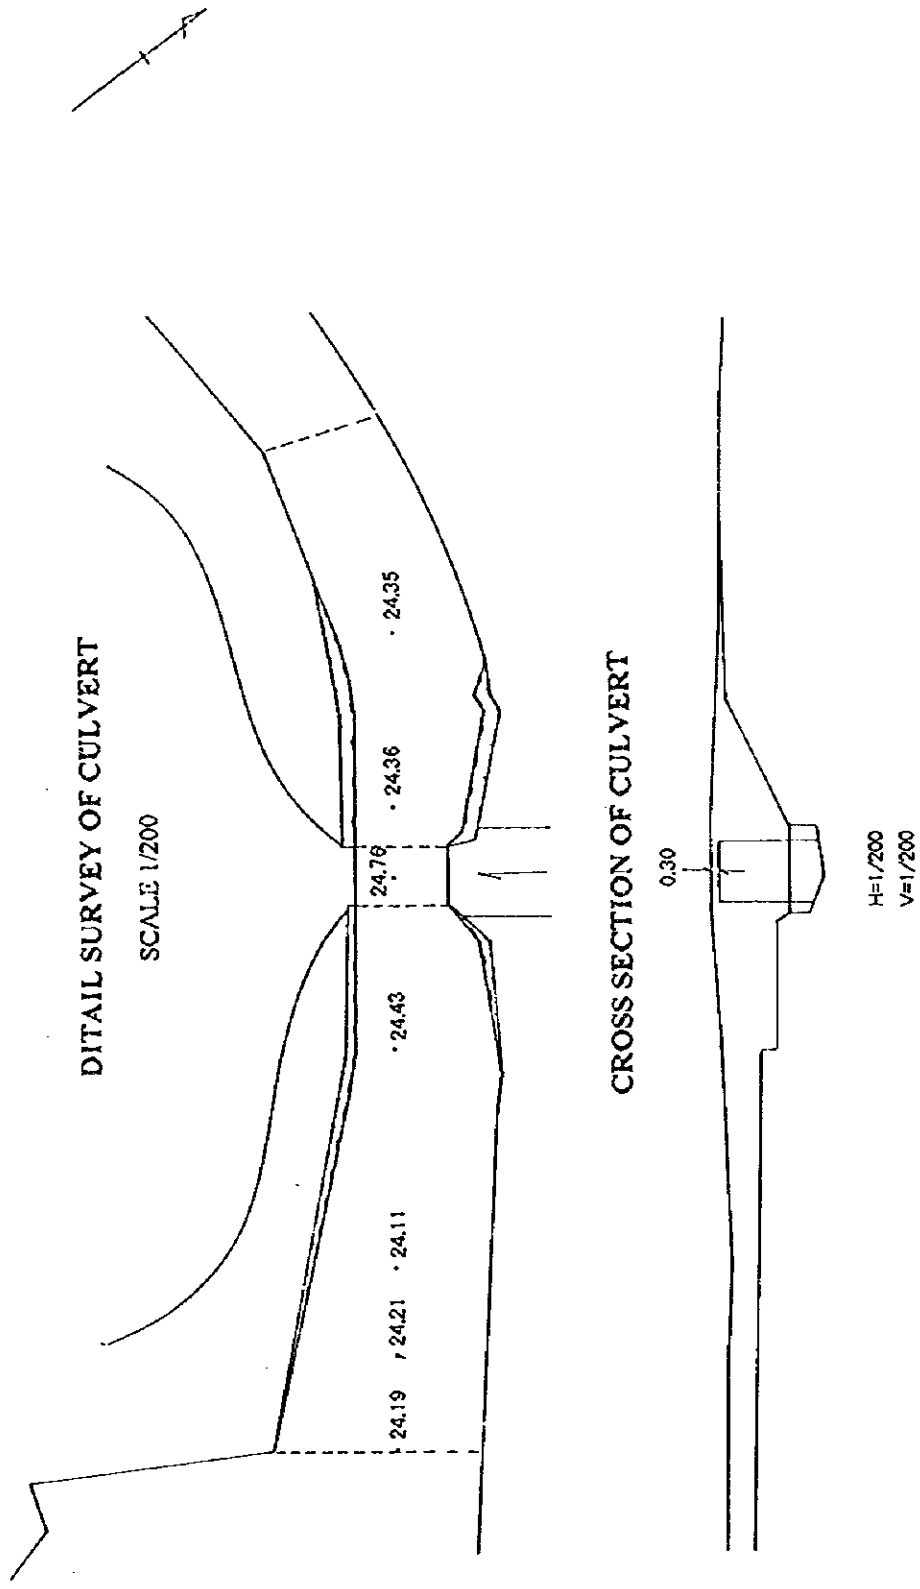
JOCOTAL DRAINAGE CULVERT (1/2)
